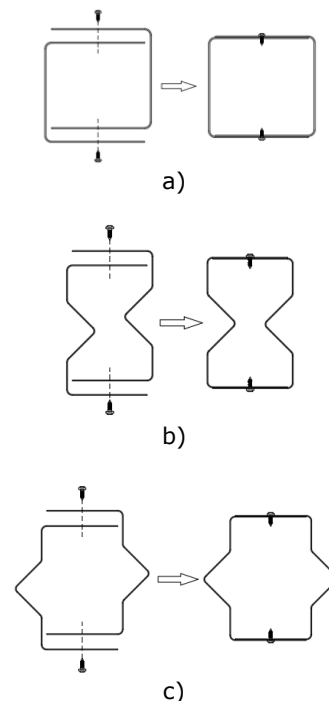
Thin-walled built-up cross-section column assembly: a) – square cross-section, Type A; b) – closed cross-section with web stiffeners pointing inwards, Type B; c) – closed cross-section with web stiffeners pointing outwards, Type C
